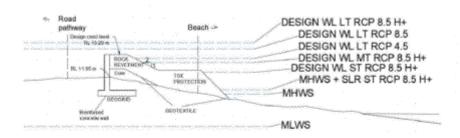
Typical design cross section of cantilevered reinforced concrete wall and revetment (Beya and Asmat, 2020).
